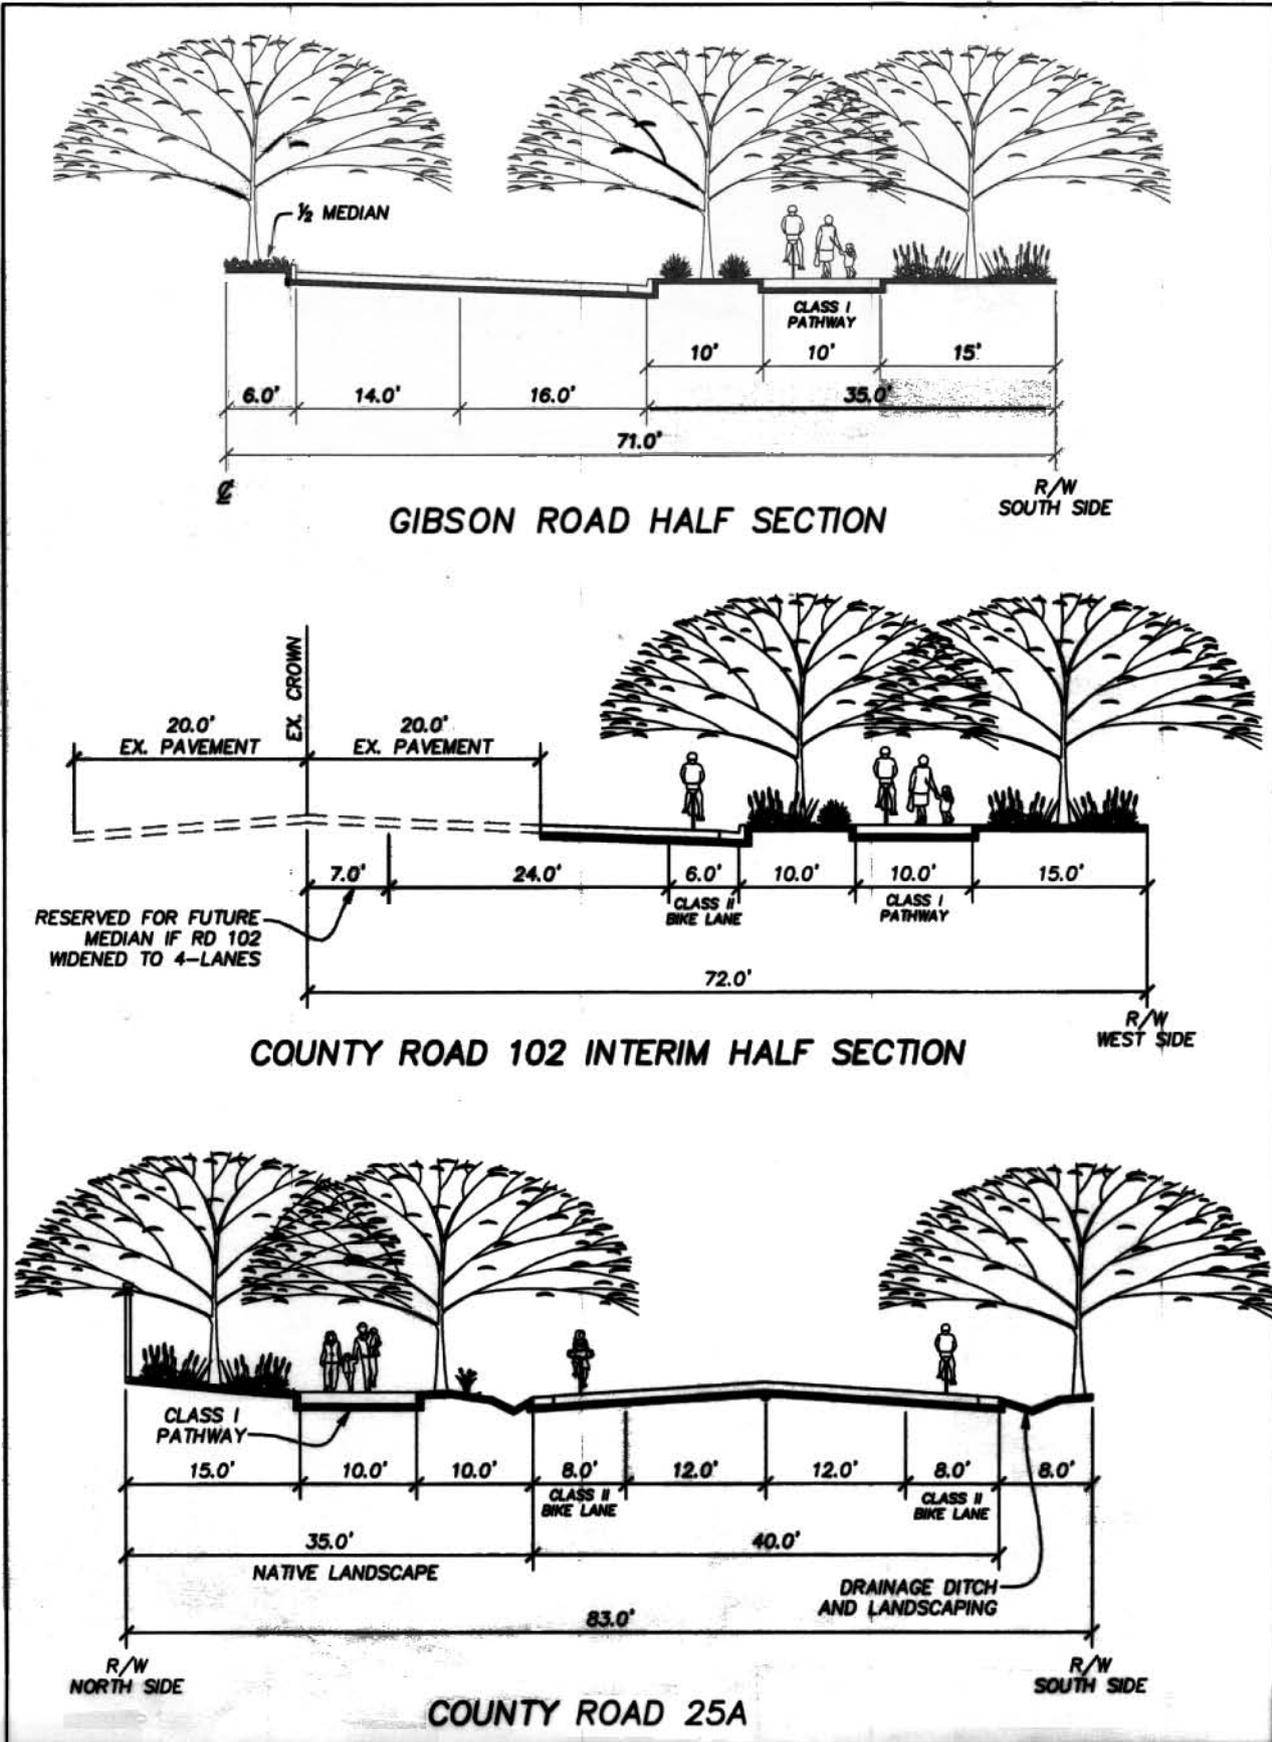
Gibson Road, CR 102, and CR 25A Cross-Sections
